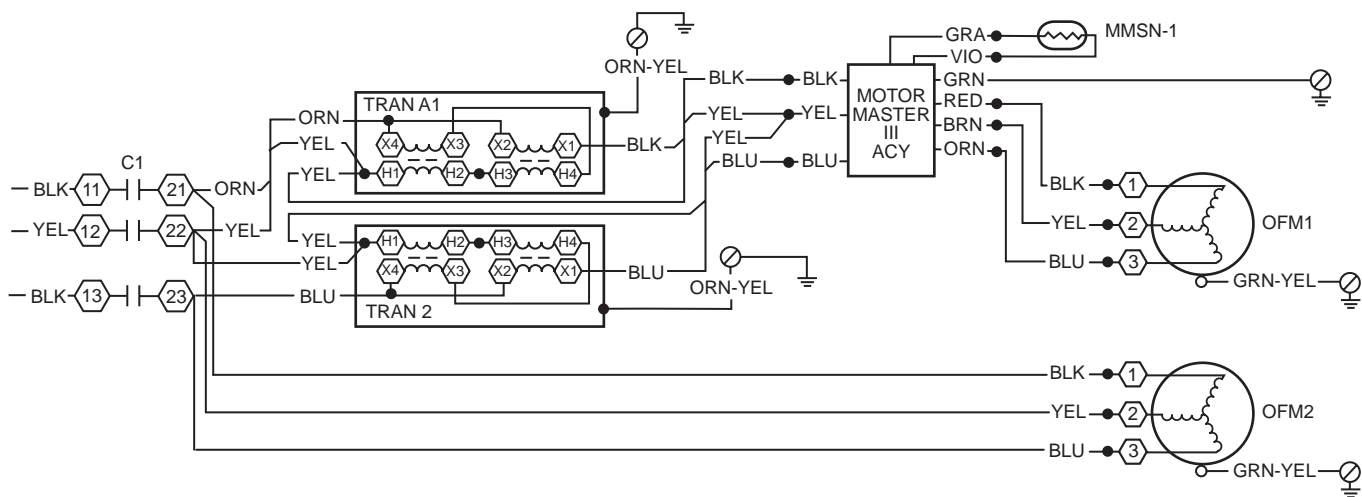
Motormaster III Device Wiring, 48/50EJ,EK,EW,EY038-068 — 575-3-60 Units
